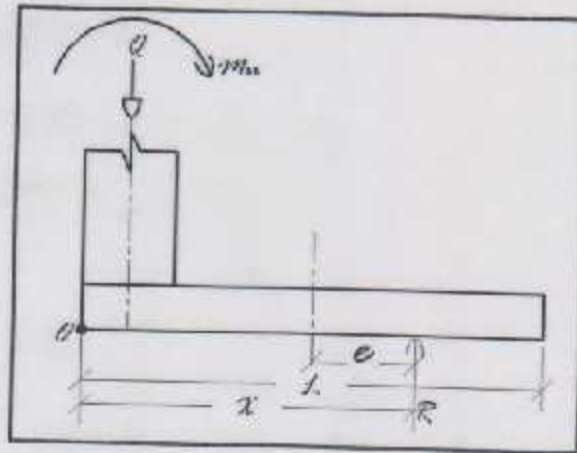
Eccentricity from center of footing - Intermediate frame footing
